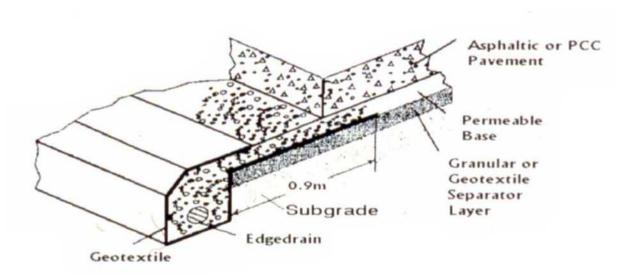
Design elements of a drainable pavement system (after FHWA, 1992).
